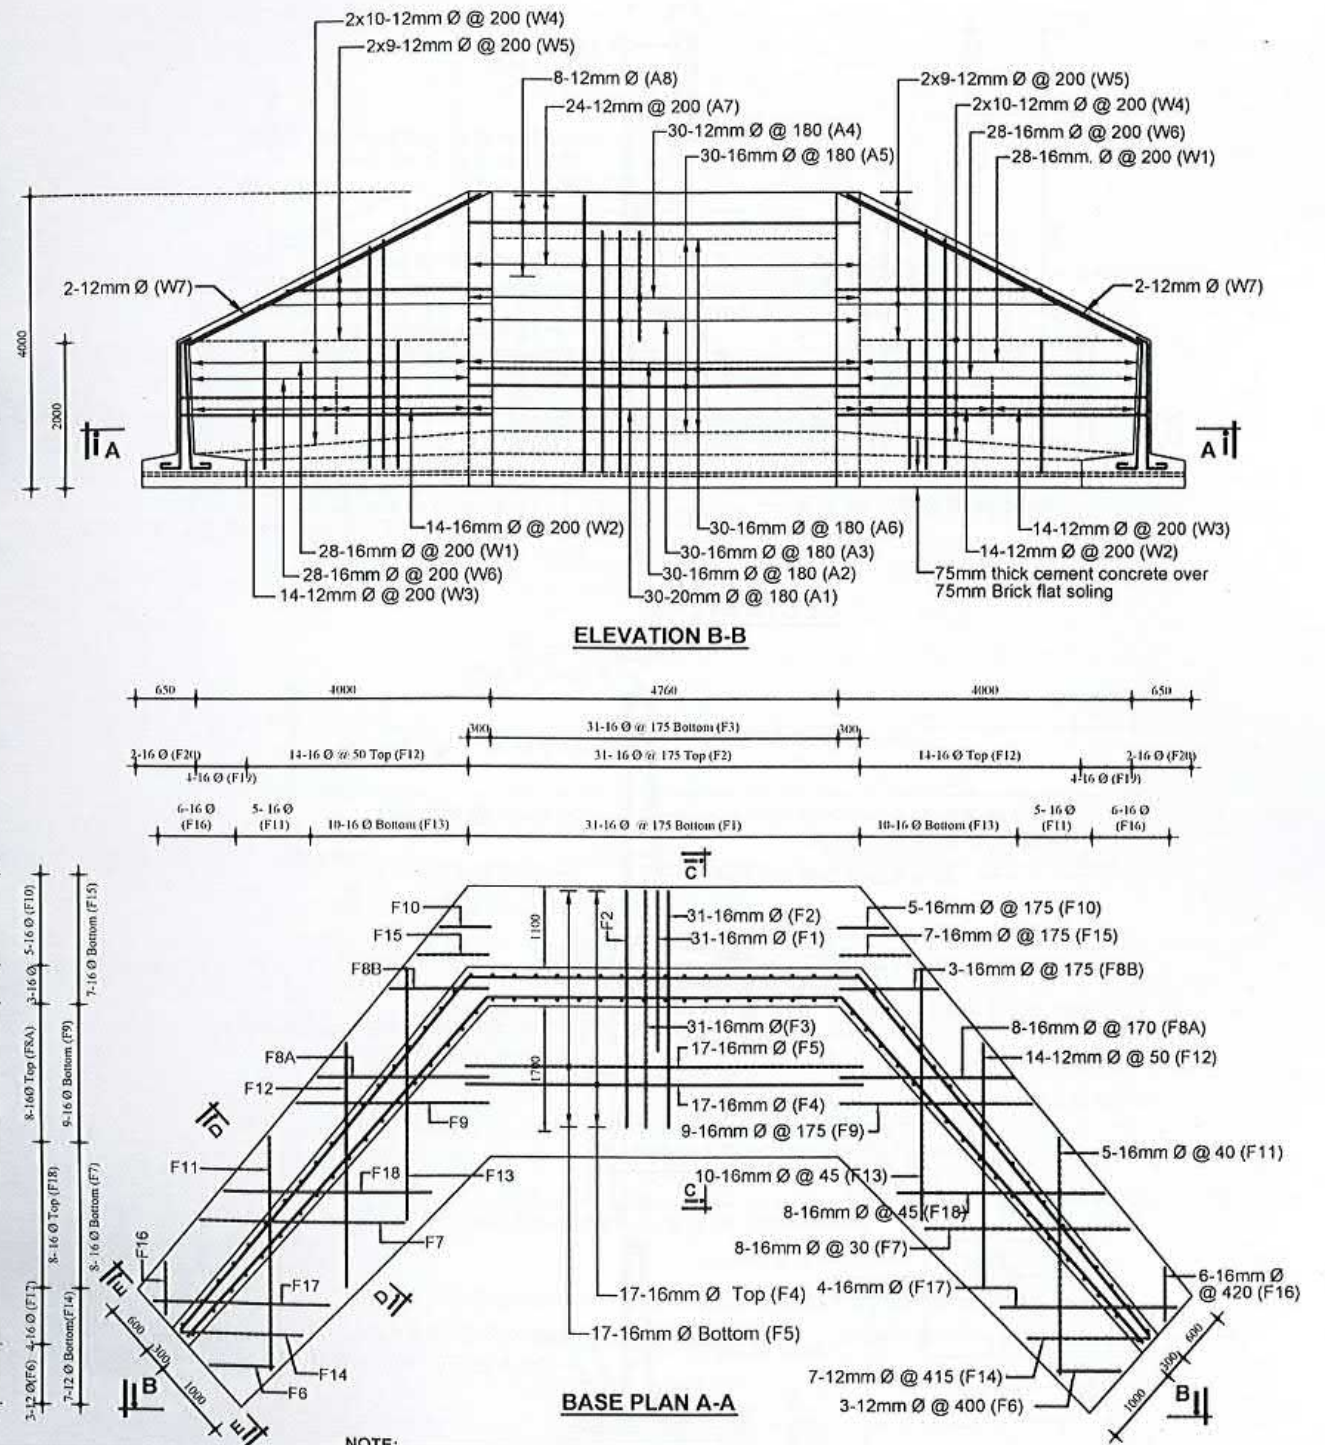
DETAILS OF CONCRETE BRIDGE SEAT BLOCK ON BRICK ABUTMENT
